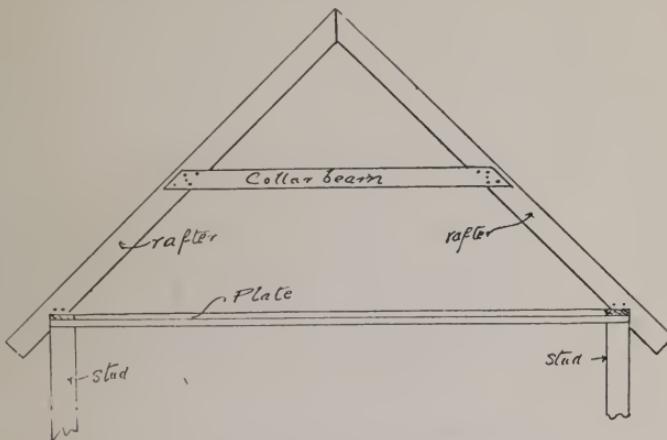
ELEVATION OF A COLLAR BEAM ROOF.
